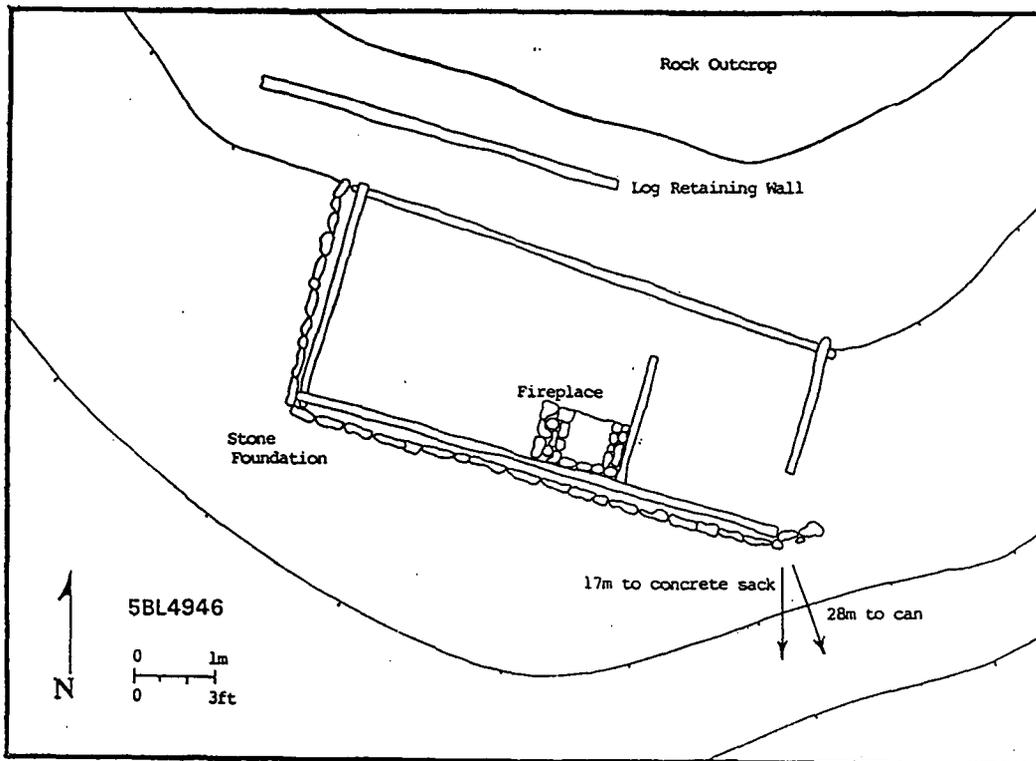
Plan view of Upper Bear Canyon Cabin.
